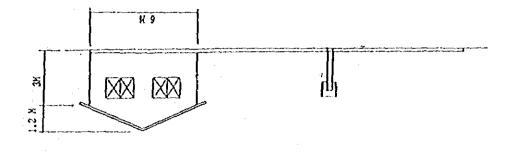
PROPOSED PLAN OF MULTI-PURPOSE DRYER
